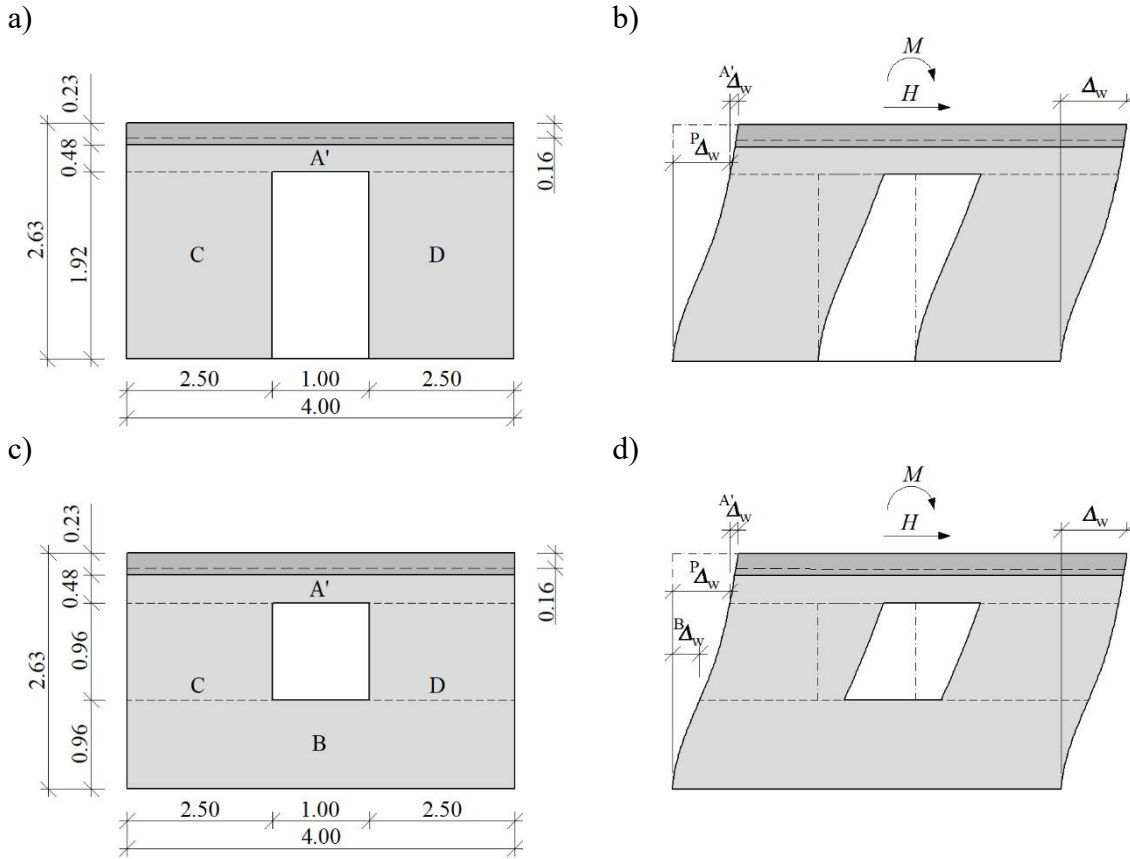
The geometrical parameters adopted for calculation in the total stiffness method: a) division of a wall with a door opening into component elements, b) deformations of a wall with a door opening, c) division of a wall with a window opening into component elements, d) deformations of a wall with a window opening
